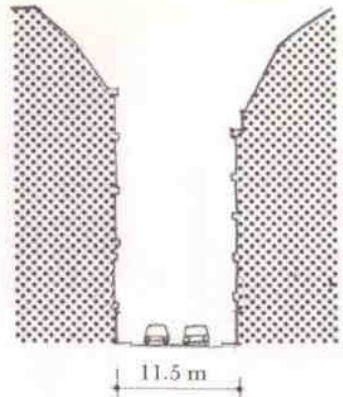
The widest street according to 1882 Building regulation. Distance between buildings=70m =11.5m (same as pavement width in Champs-Elysées)
